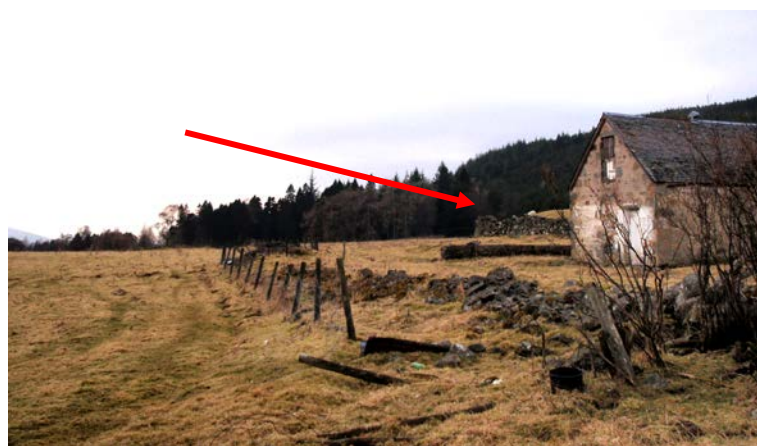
Existing steading and adjacent site of proposed dwellinghouse
